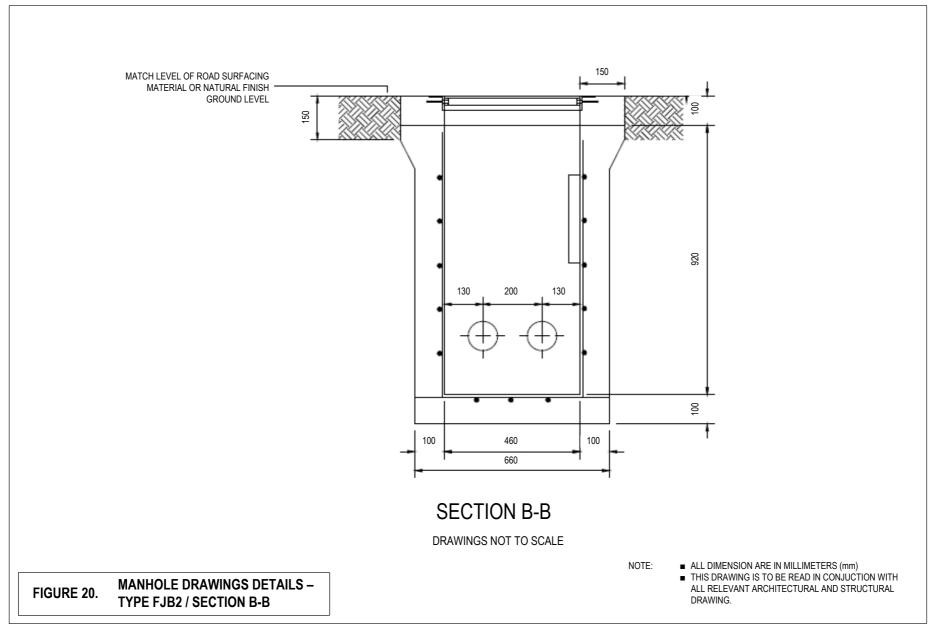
Manhole drawings details - Type FJB2 / section B-B
